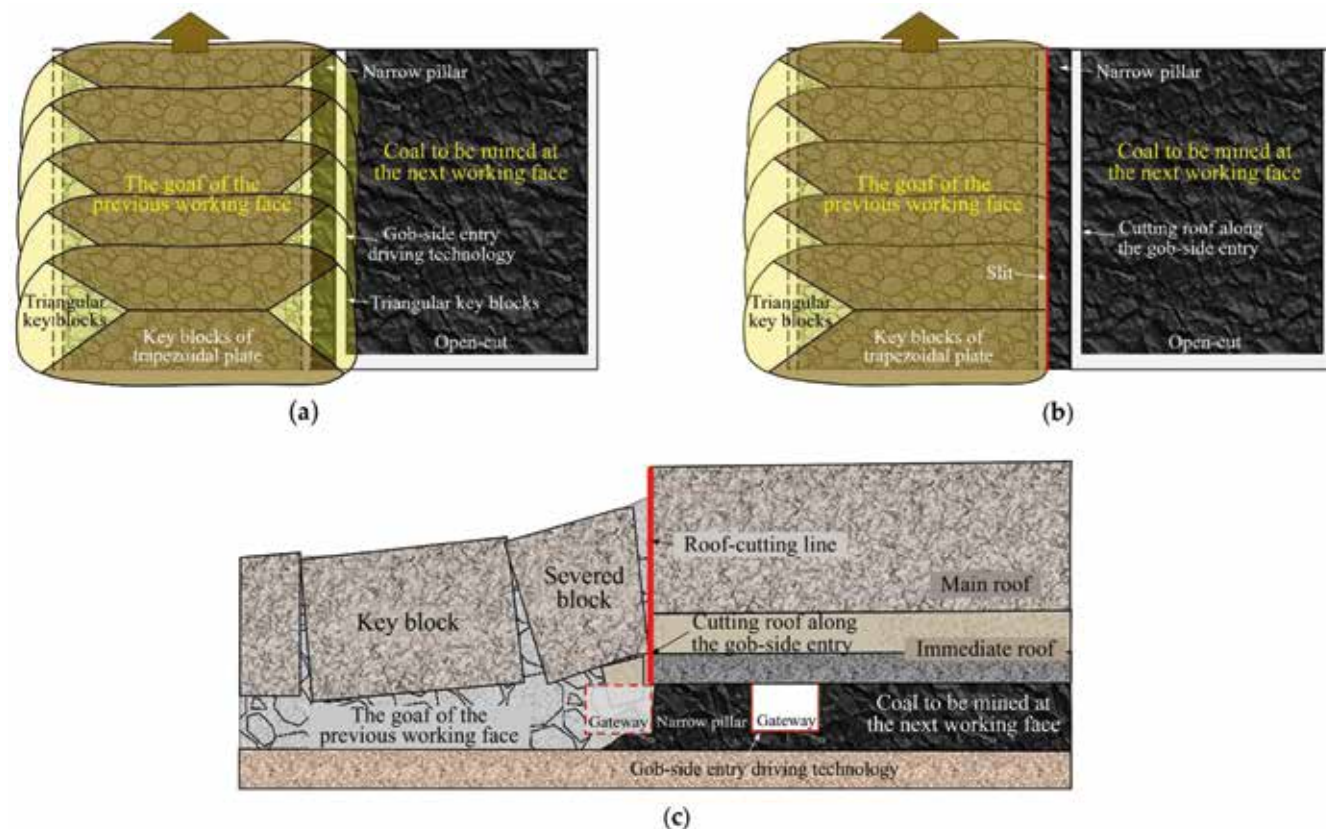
The schematic diagram of roof-cutting for gob-side entry driving. (a) Roof structure without roof cutting (b) Roof structure after roof cutting (c) Cutting roof and unloading the pressure along the gob-side entry.
